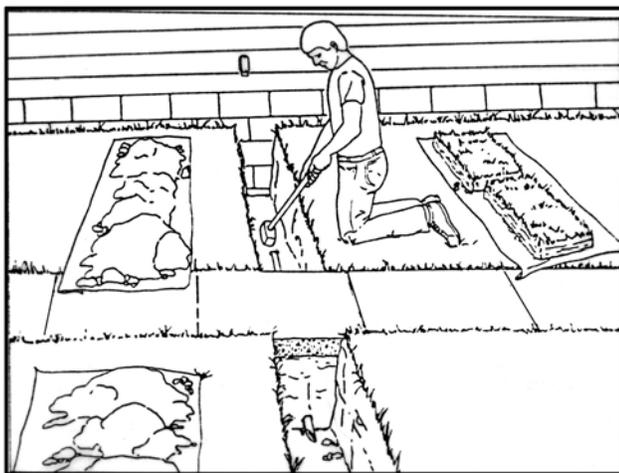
To pass the wiring under a sidewalk block or a large tree root, drive a length of iron pipe through the soil with a sledge hammer. You will be able to pull the wiring or push the conduit through the hole after removing the pipe.
